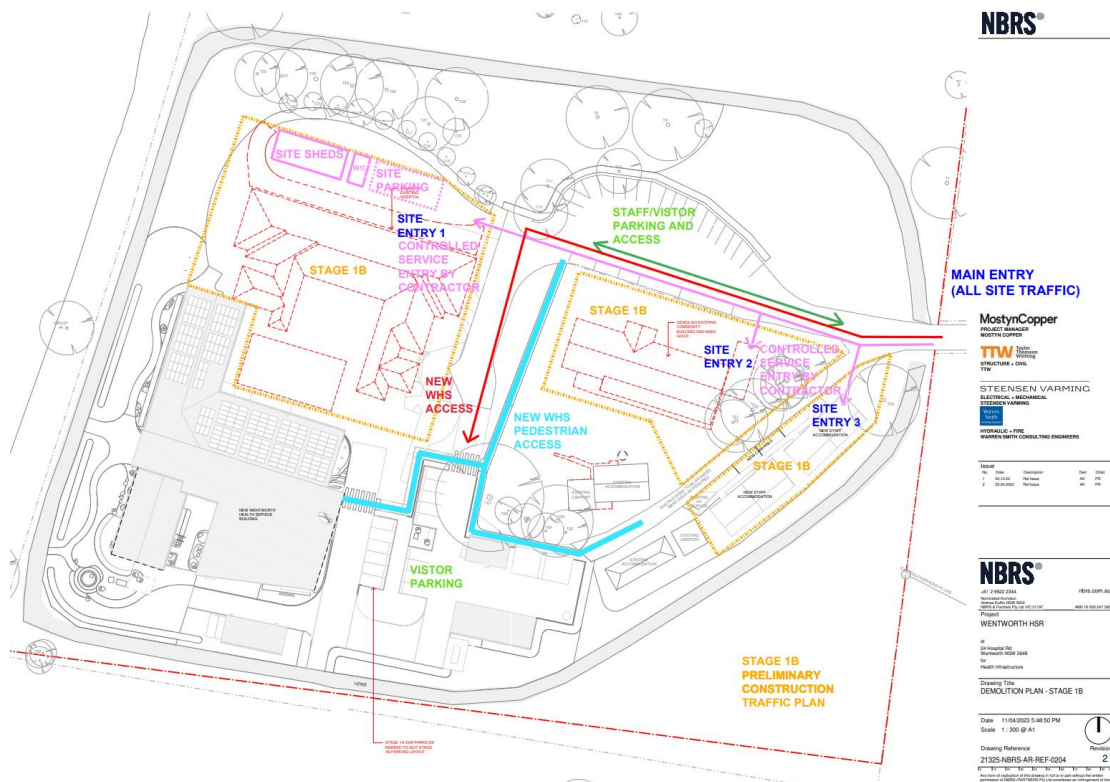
Stage 1B Preliminary Construction Traffic Management Plan (MostynCopper and SCT)
